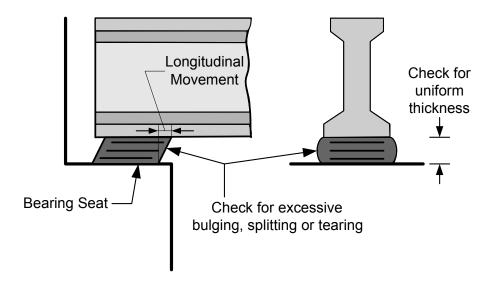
Elastomeric Bearing Inspection Checklist Items
